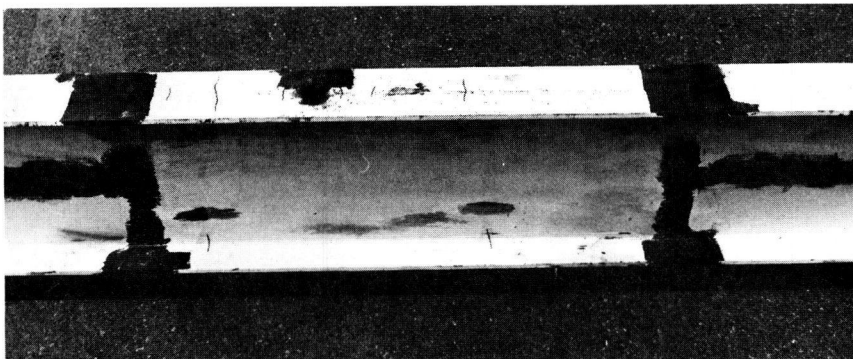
Fatigue cracks in compression flange (top) and tension flange (bottom) for A514 steel beam PWC-151.
